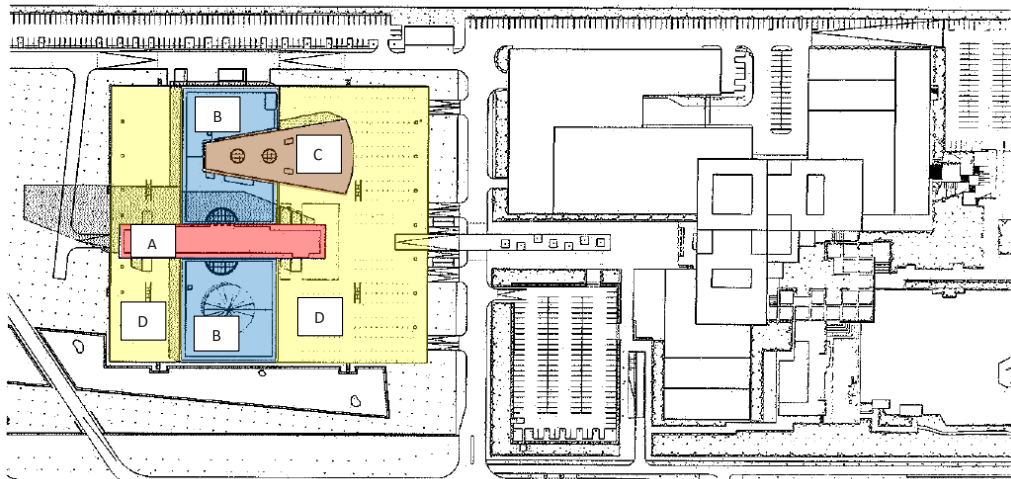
Site plan of the Provinciehuis Utrecht (Drunen & Hendriks, 2017).
